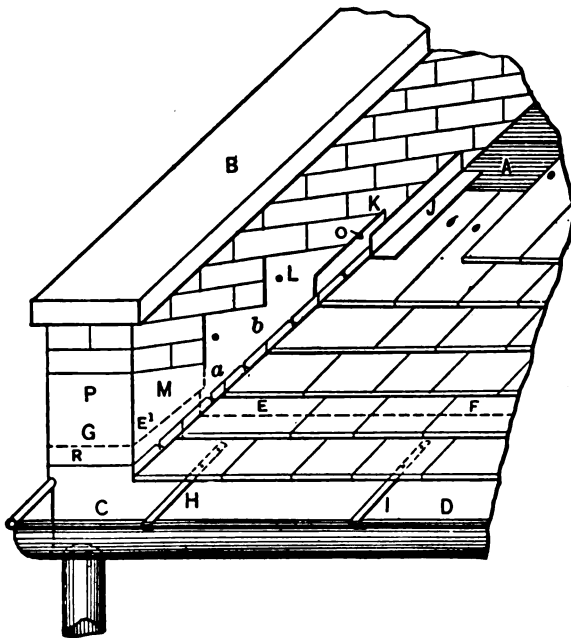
Putting in Step and Counter or Cap Flashing for Shingle or Slate Roof
